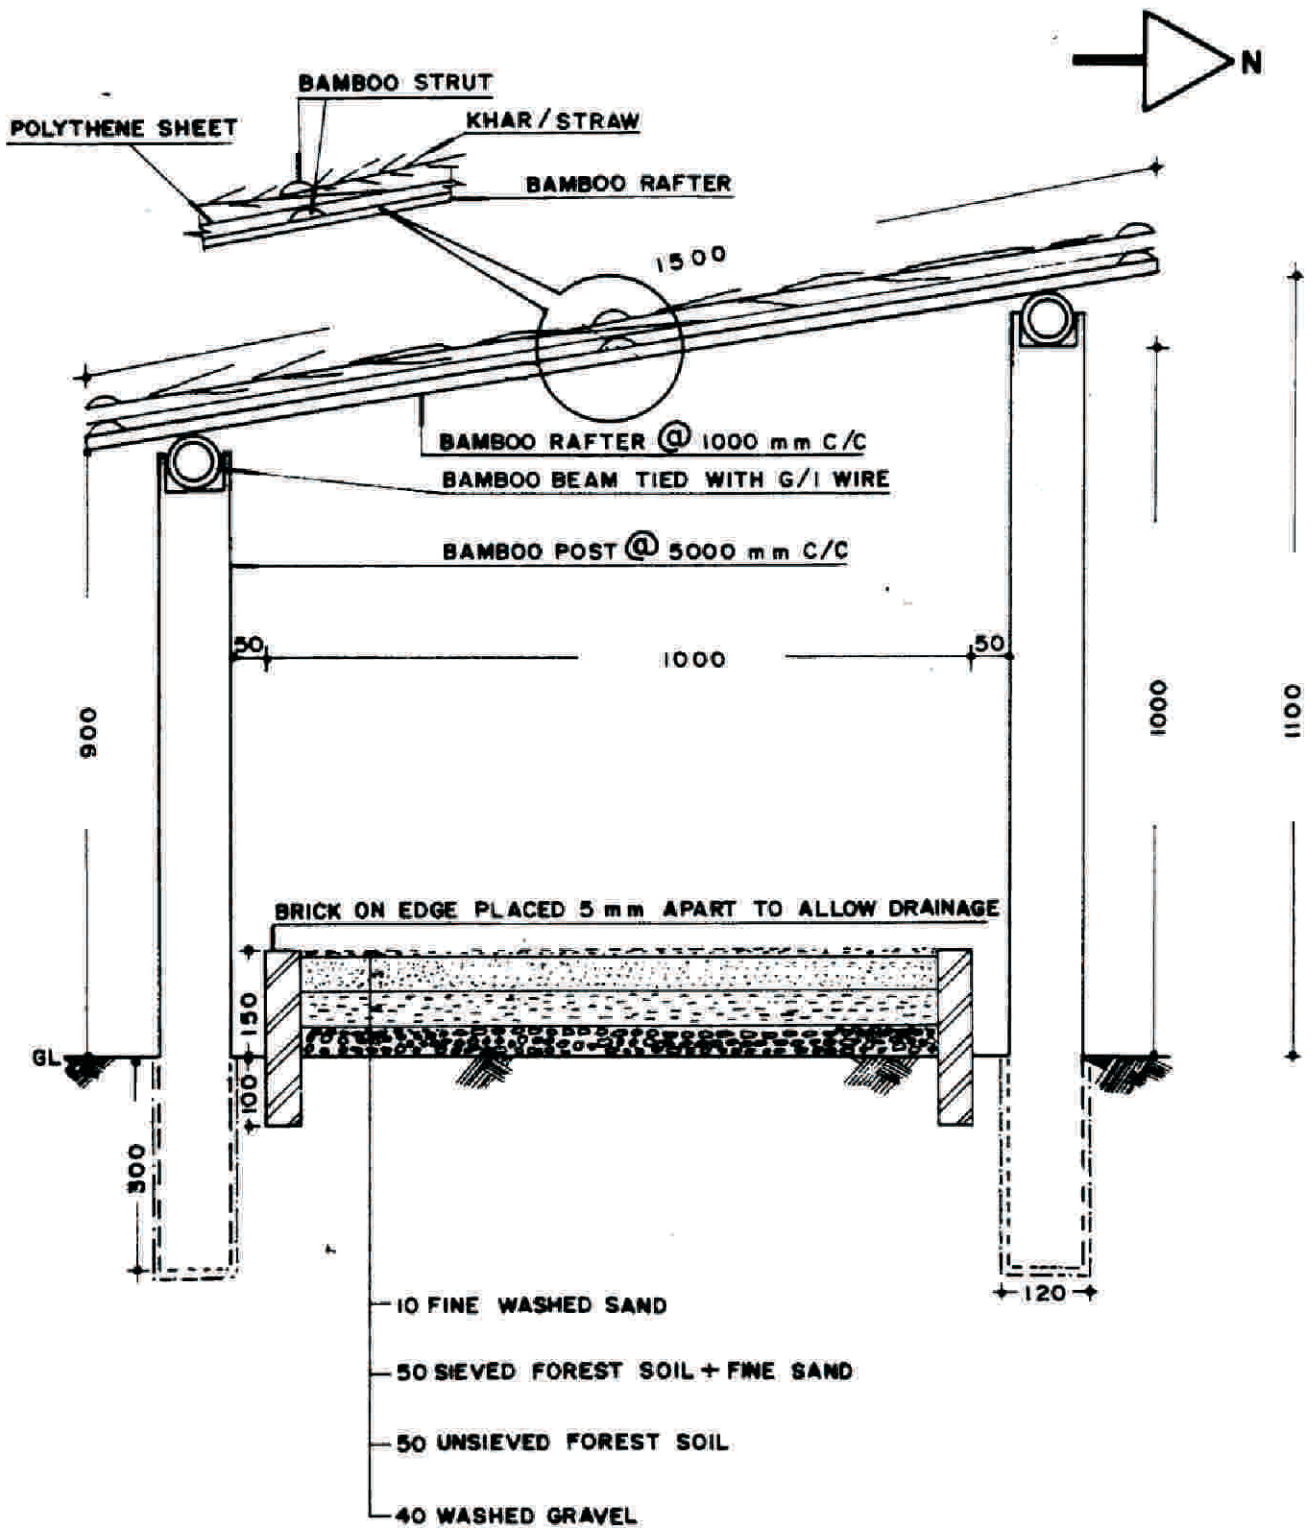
Typical cross section of tree/shrub seed bed.
